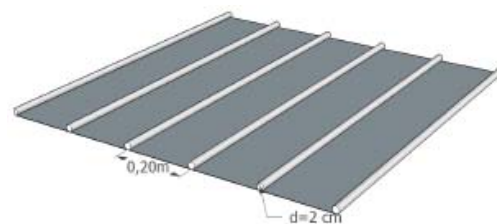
Chilled ceiling geometry (pipe spacing and pipe diameter). Drawn to scale
